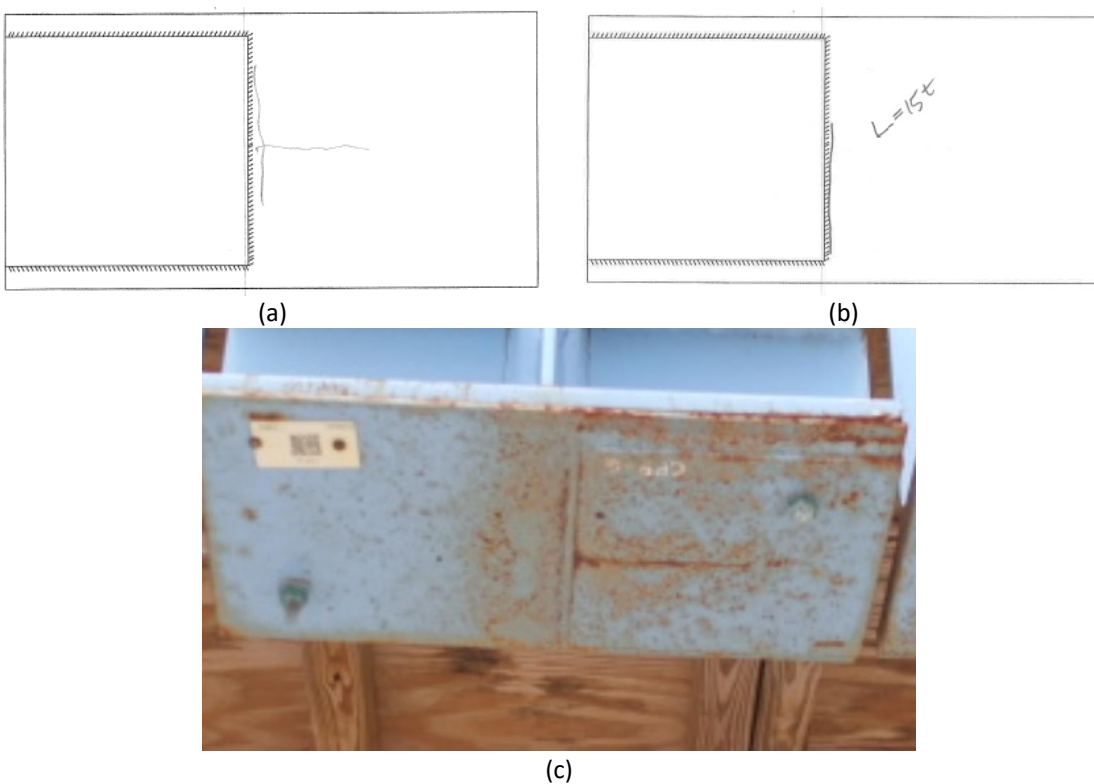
A welded cover plate specimen CPP-6 (a) realtime report, (b) postmortem report, and (c) inspection image taken by the DJI Phantom
